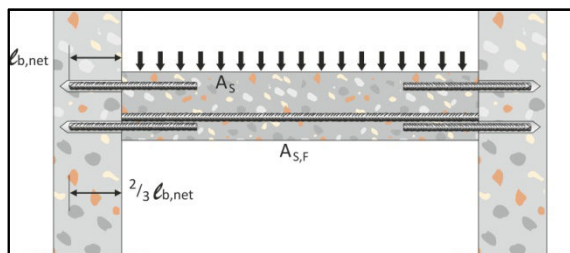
End anchoring of slabs or beams, designed as simply supported.
